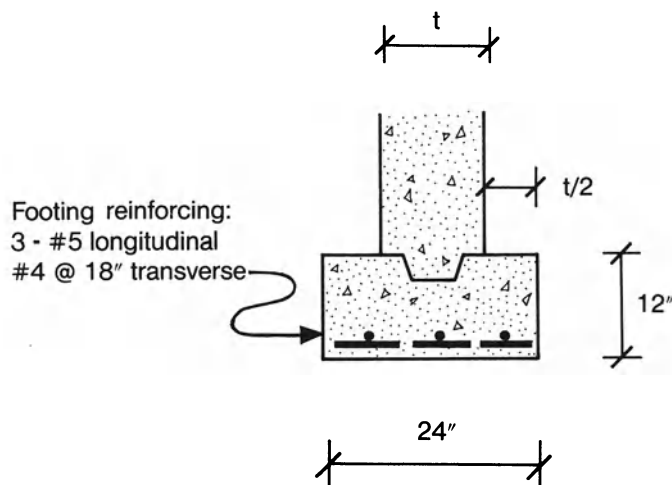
Recommended minimum size and reinforcing for wall footings.
